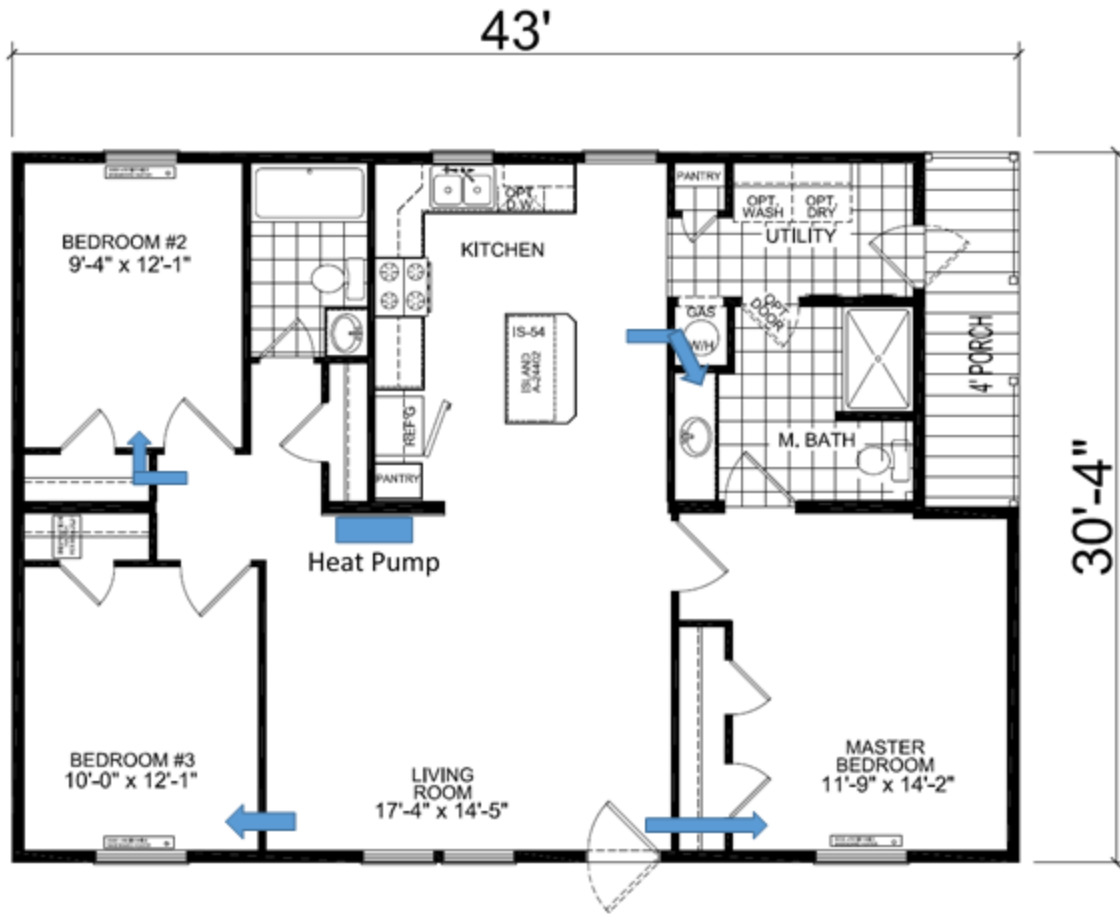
New Jersey floor plan, showing heat pump (blue rectangle) and transfer fans (blue arrows)
